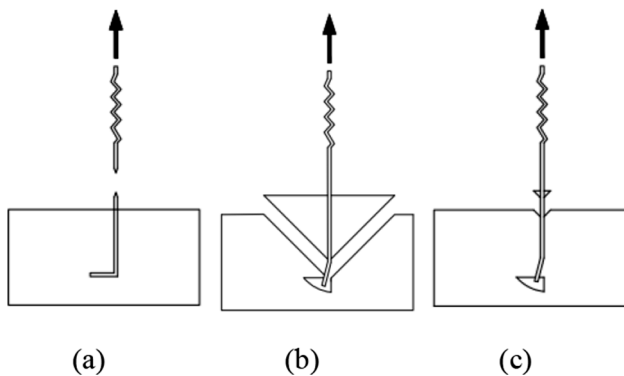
Failure modes in Tension: Tie failure(a), Cone break-out failure (b) and pull-out failure (c).
